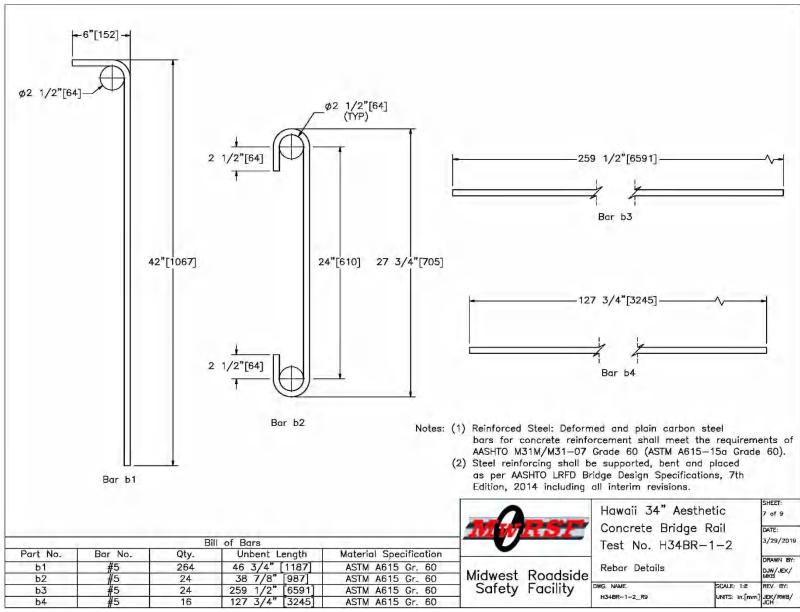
Rebar Details, Test Nos. H34BR-1 and H34BR-2
